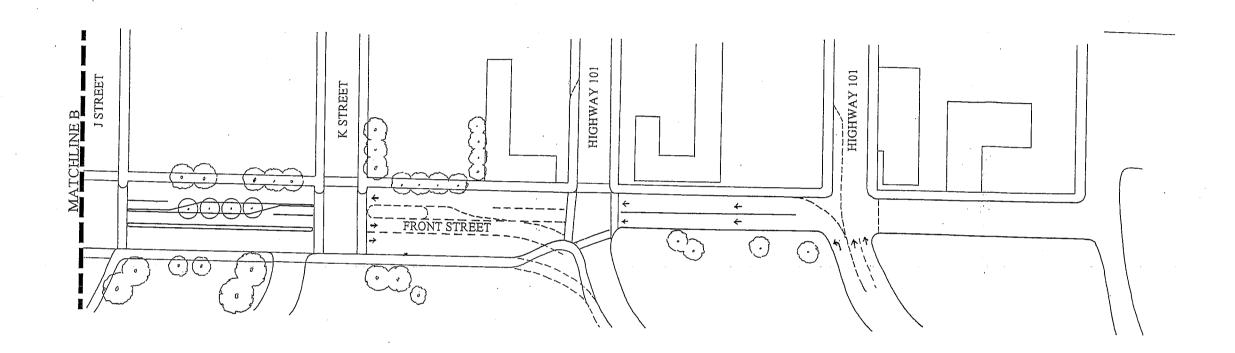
Proposed Front Street Improvements Front Street 8 8 110 45 Degree bulbing Parking Conceptual: not to scale
